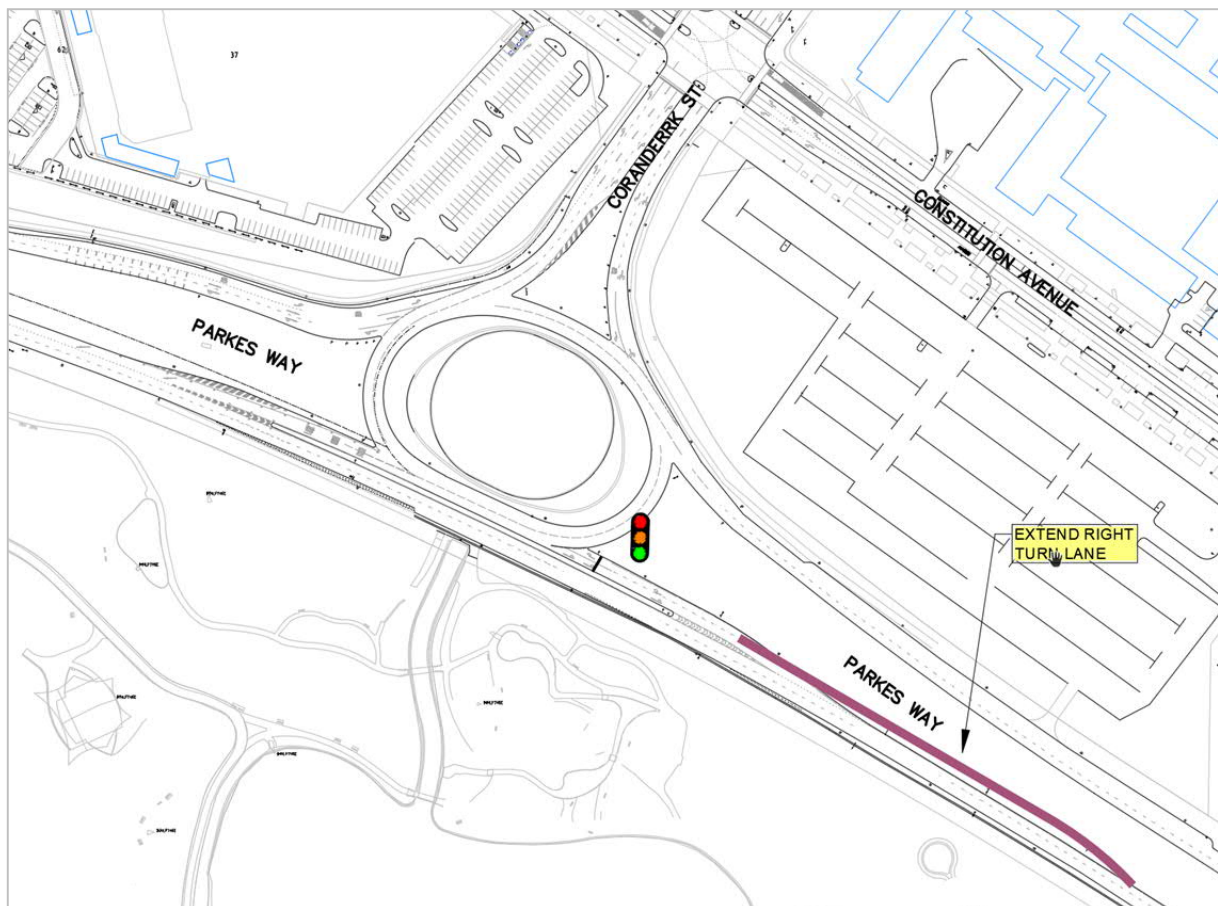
Option 11-8 Provide signals to create a metered roundabout at Coranderrk Street/Parkes Way – maintaining the west bound bypass lane
